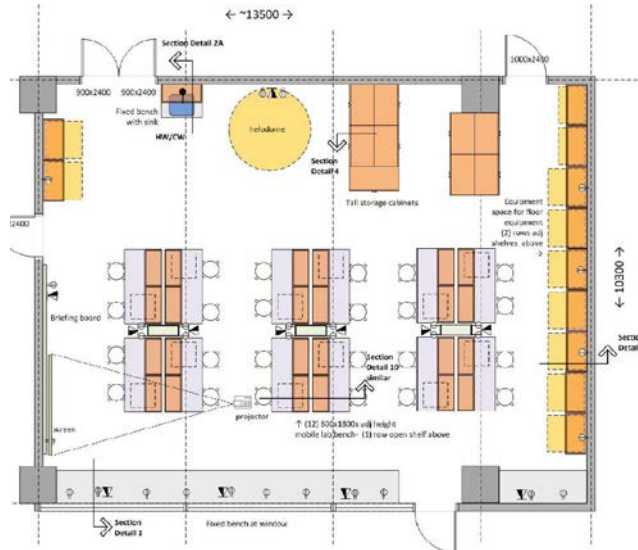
Layout plan of facilities in B369 (not to scale)
